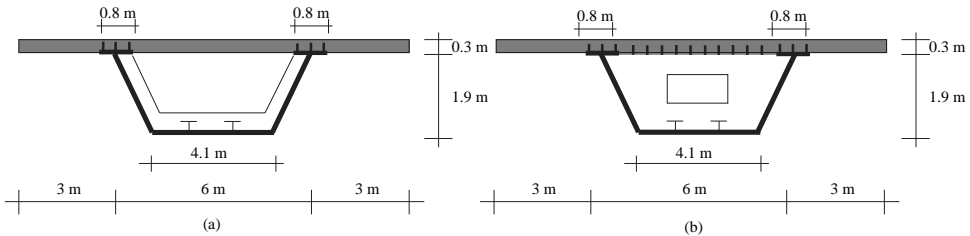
Box-girder cross section geometry: (a) mid-span cross-section and (b) support cross-section.
